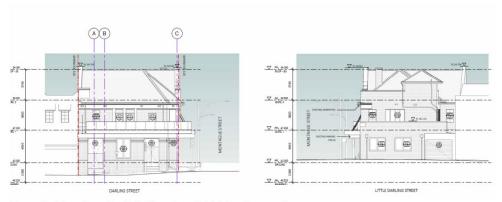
Elevation - North (left) and south (right) - Proposed. Source: Public Design Studio, AR-DA-0206, Rev 02, 29.7.2022
